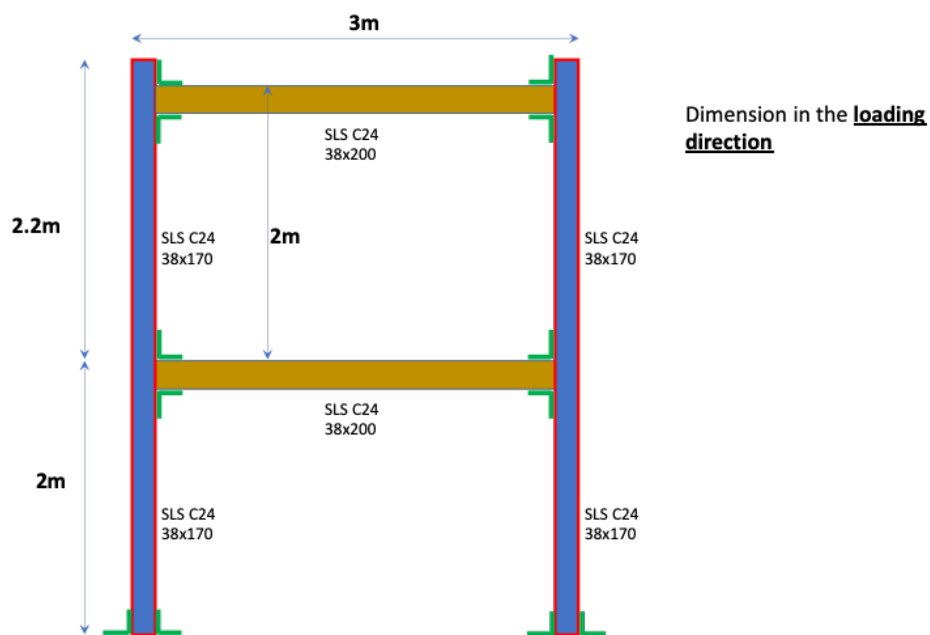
Designed timber host structure to be tested on the shake table, frame in the shaking direction
